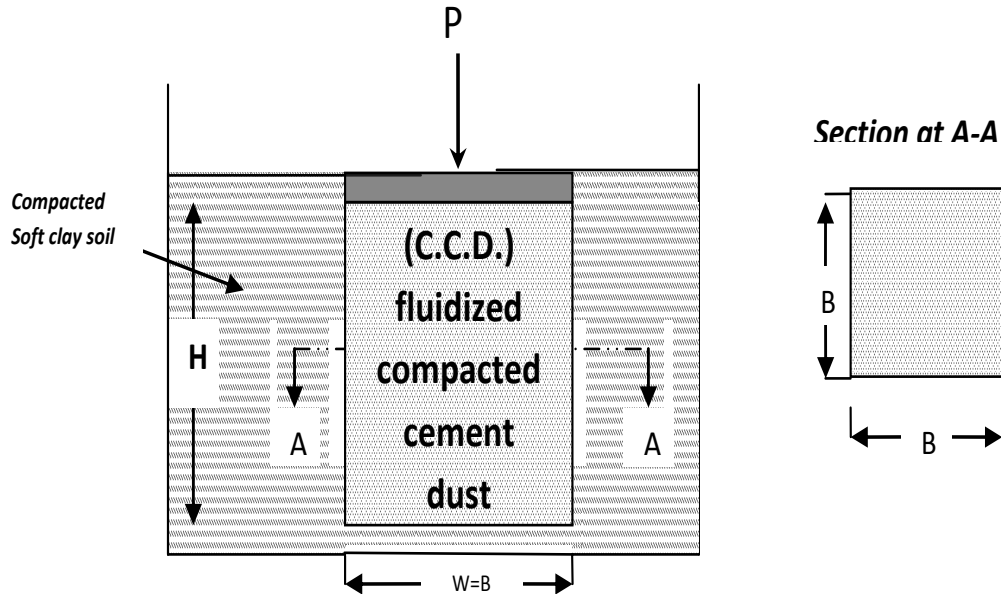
Rectangular footing on C.C.D., note that: width of compacted cement column C.C.D. = W , width of footing = B , $W=B$
